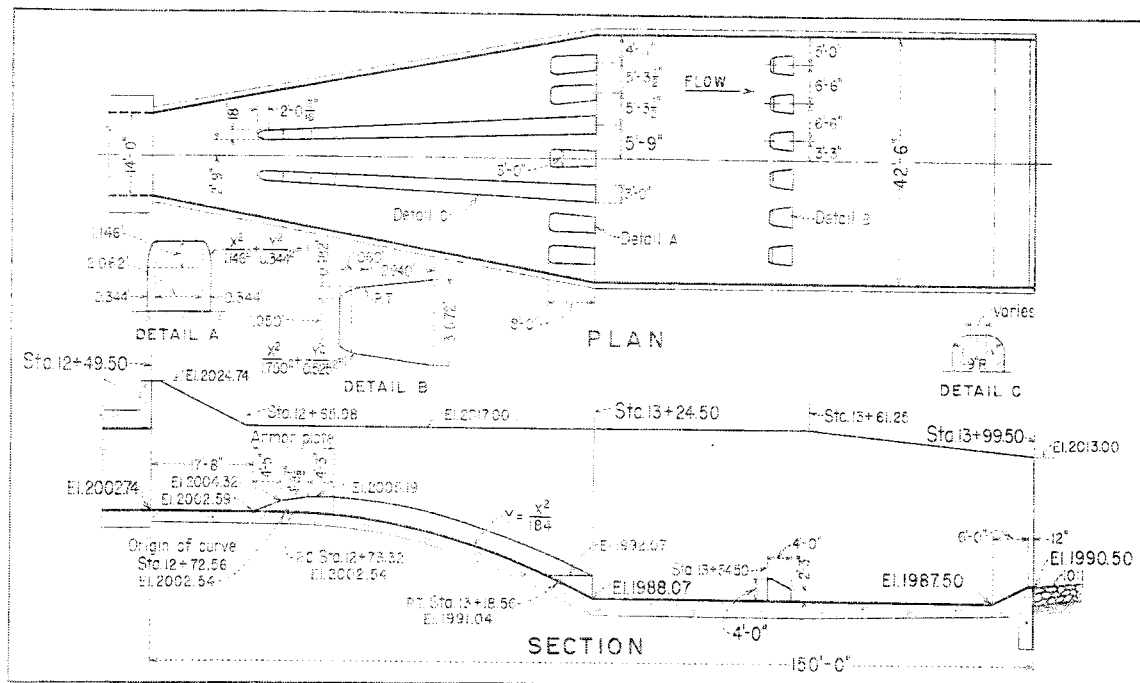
Stilling basin details for the spillway and outlet works at Heart Butte Dam.
